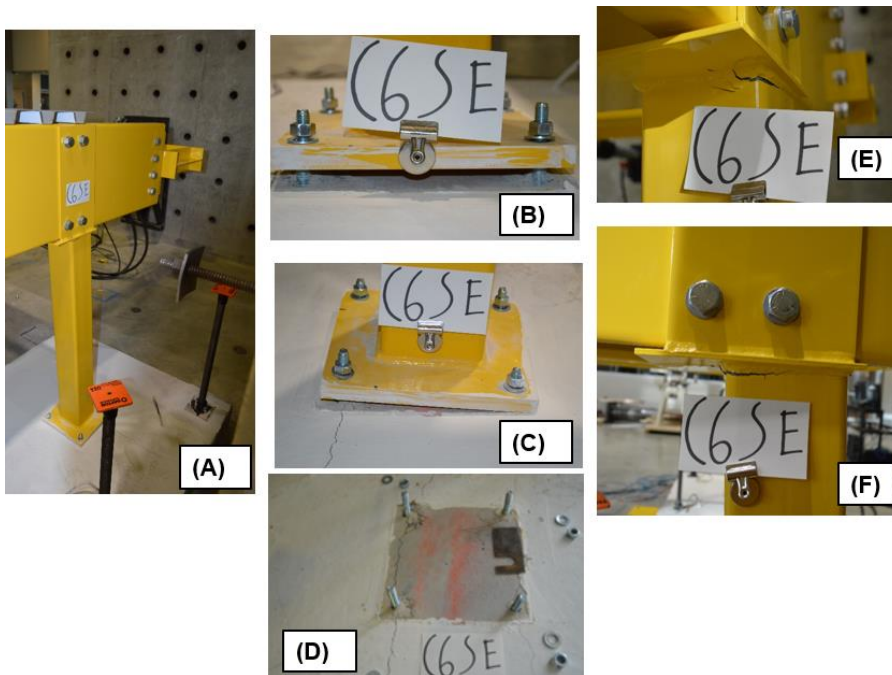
POST-TEST VIEWS OF COLUMN C6SE
